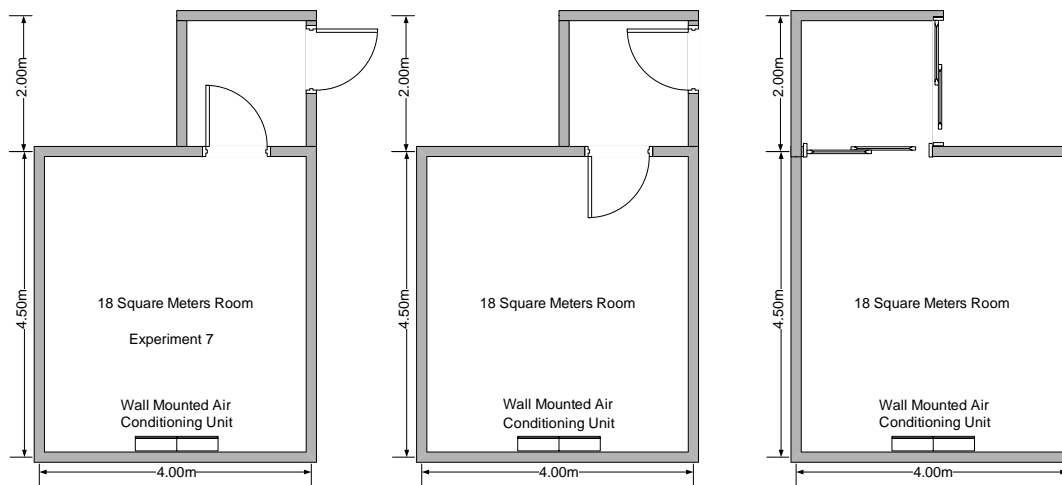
Floor Plan of Experiments 7 – 9: A Double Perpendicular Door
